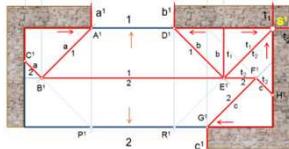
Constructing the orthographic projection of the roof (plan view). Animated step-by-step construction presented in PowerPoint
